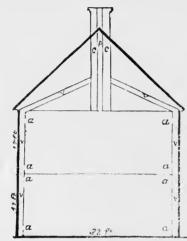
Section of a Two-storey House, showing Plan of Ventilation.
